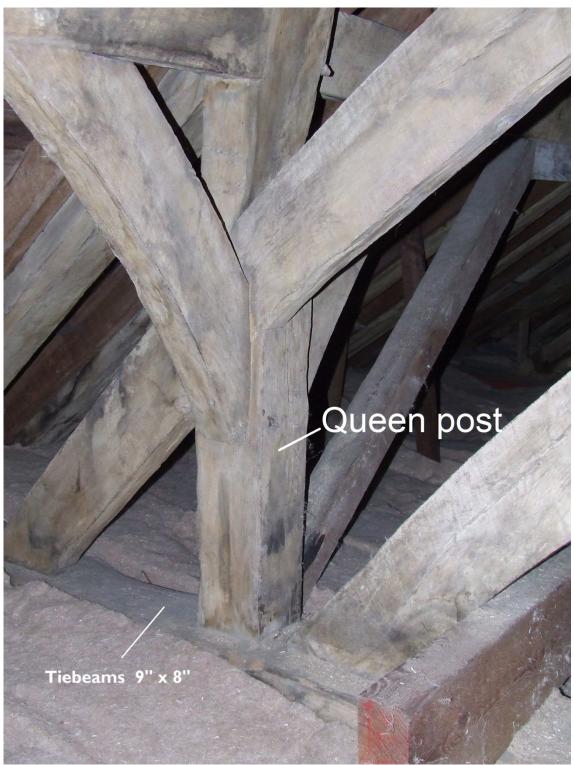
View of a queen post and other truss elements showing the yellow ochre decoration (photograph Martin Bridge)
